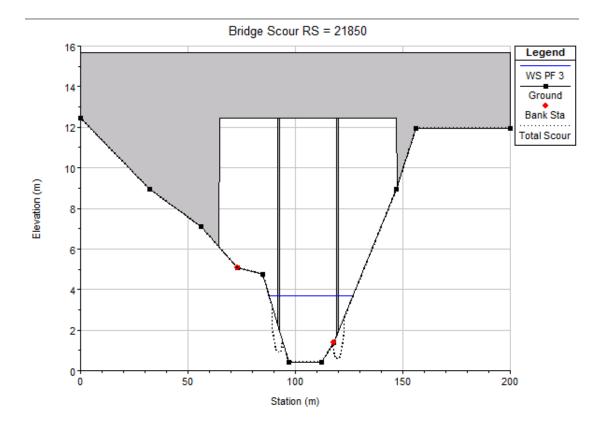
, Pier scour of the bridge when protected by riprap and wing walls - 2011
